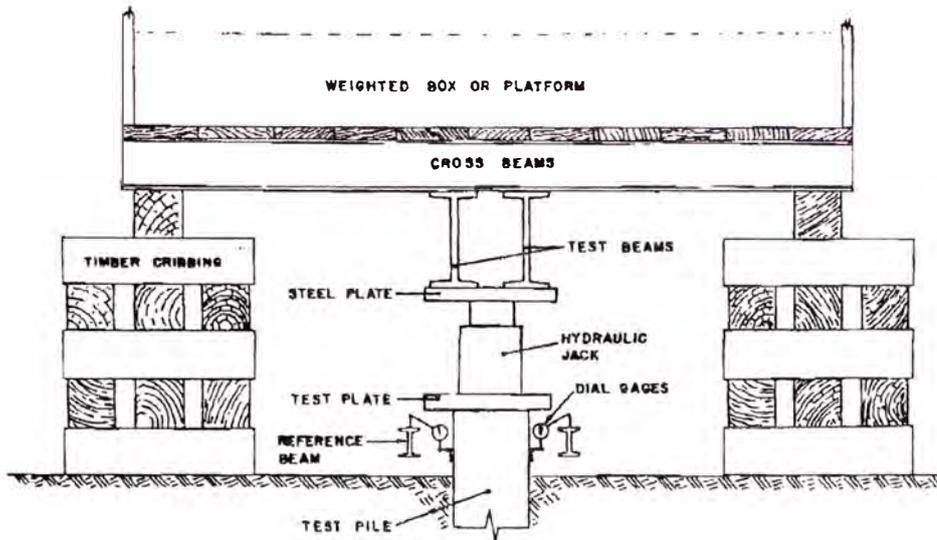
Schematic Set-Up for Applying Loads to Pile Using Hydraulic Jack Acting Against Weighted Box or Platform
